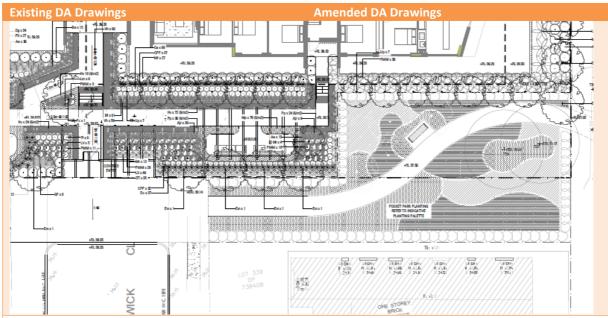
Amended DA landscape entry to Building C from Randwick Close with access ramp / widened pathway and upgrade to footpath from Randwick Close Daruk Park which includes subject site land
